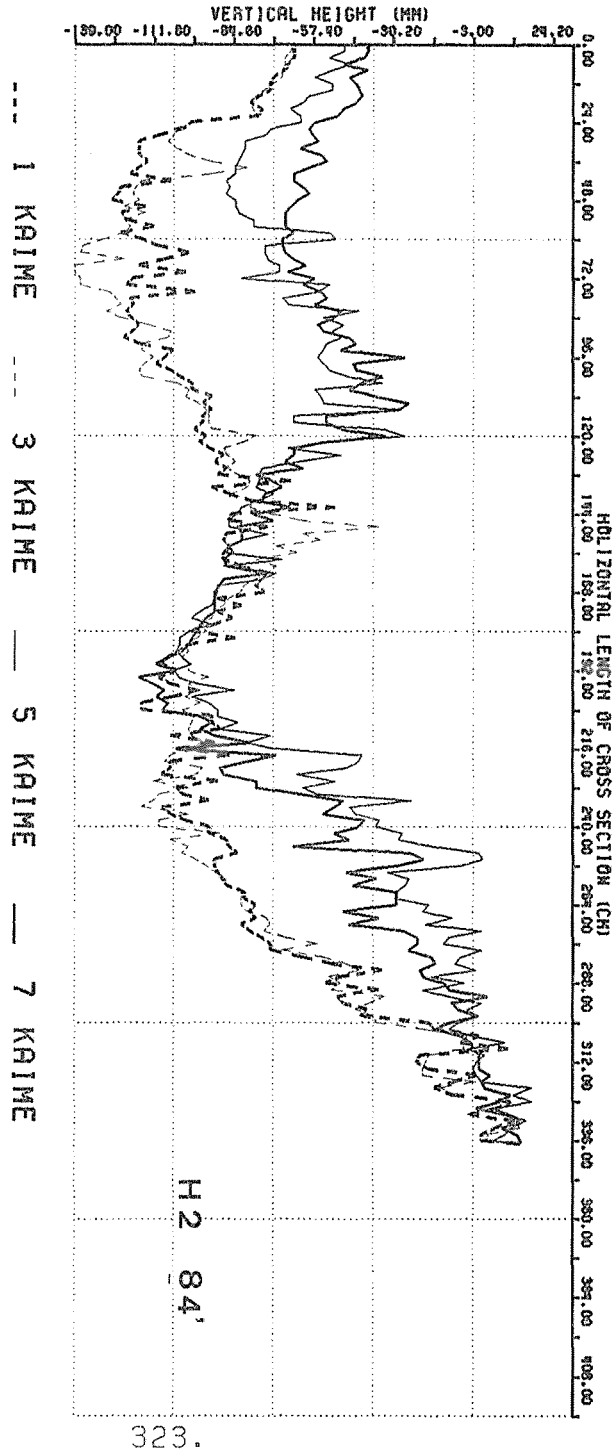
The profile of cross section of forest road (at 30 meter from outlet)
